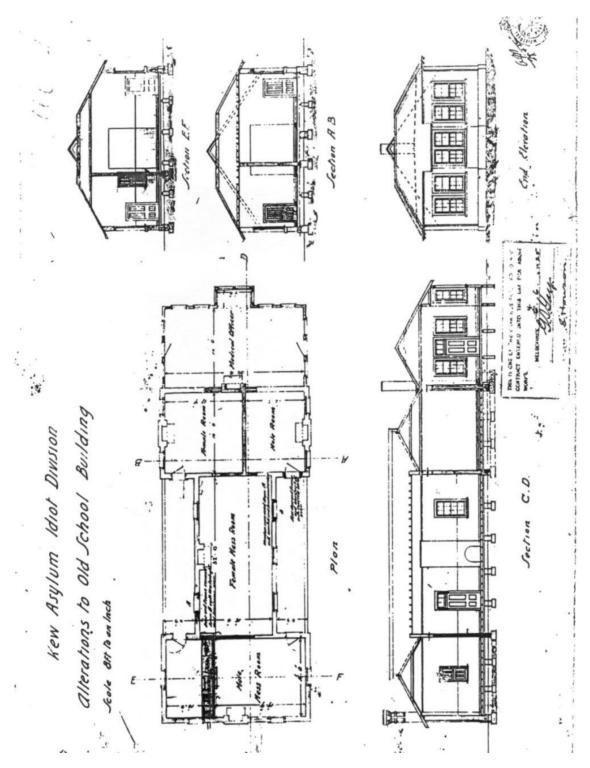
1925 showing alterations to Old School Building Source: Public Works Department, 1925 *Kew Asylum Idiot Division. Alterations to Old School Building,* signed GS Gay 4.6.25, BSA Drawings MHK (PROV)
